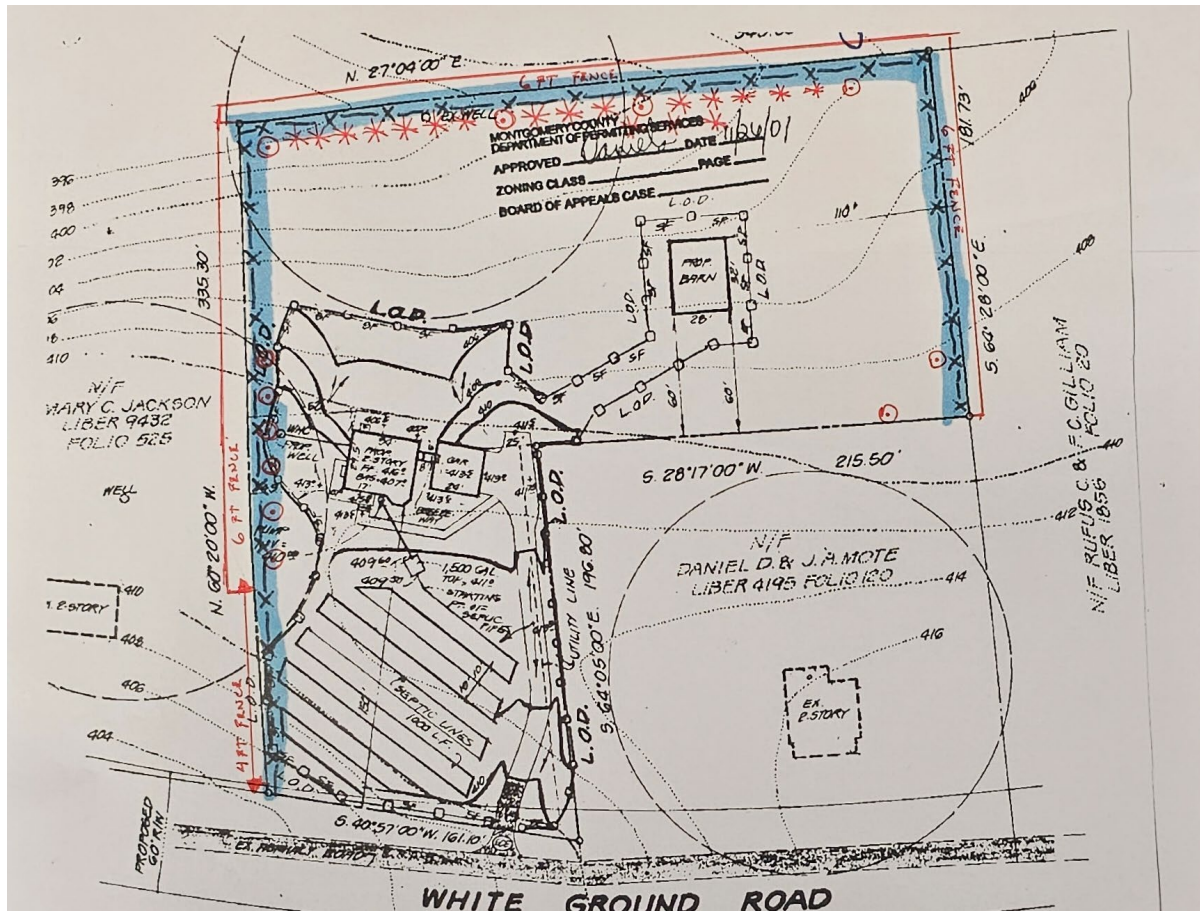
Site plan showing the proposed locations of the 4'-tall and 6'-tall fence, 2023. Source: Applicant.
